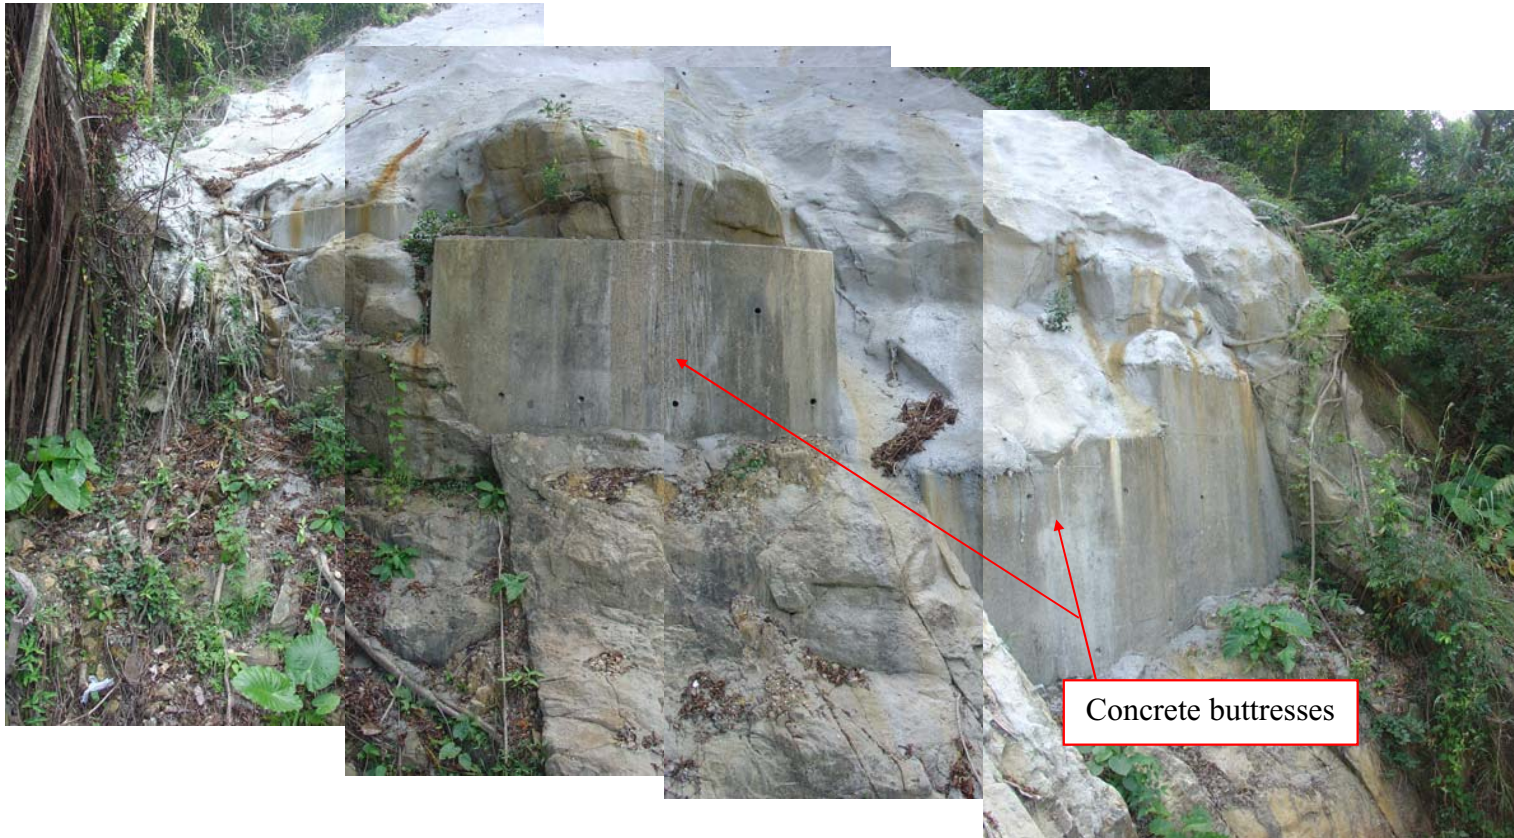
Concrete Buttresses Supporting Rock Overhangs above Bowen Road
